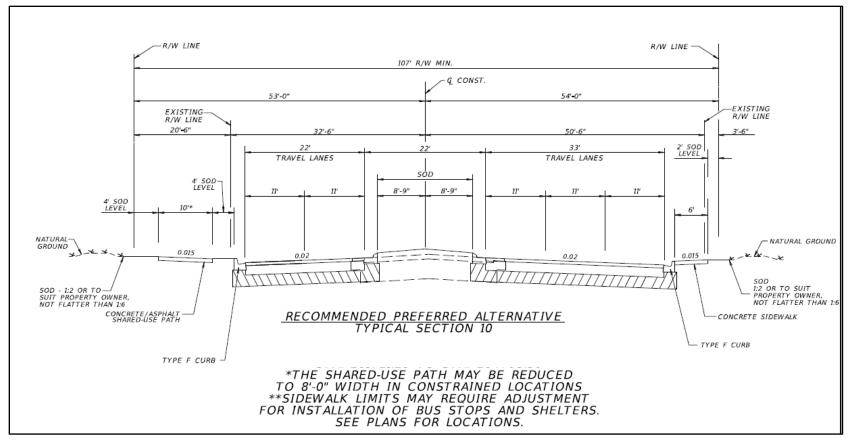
Preferred Alternative Representative Typical Section – West of Plaza Shopping Center
